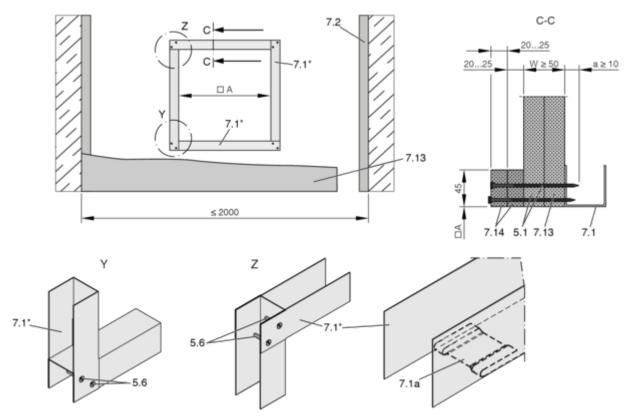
Shaft wall without metal support structure and with cladding on one side
